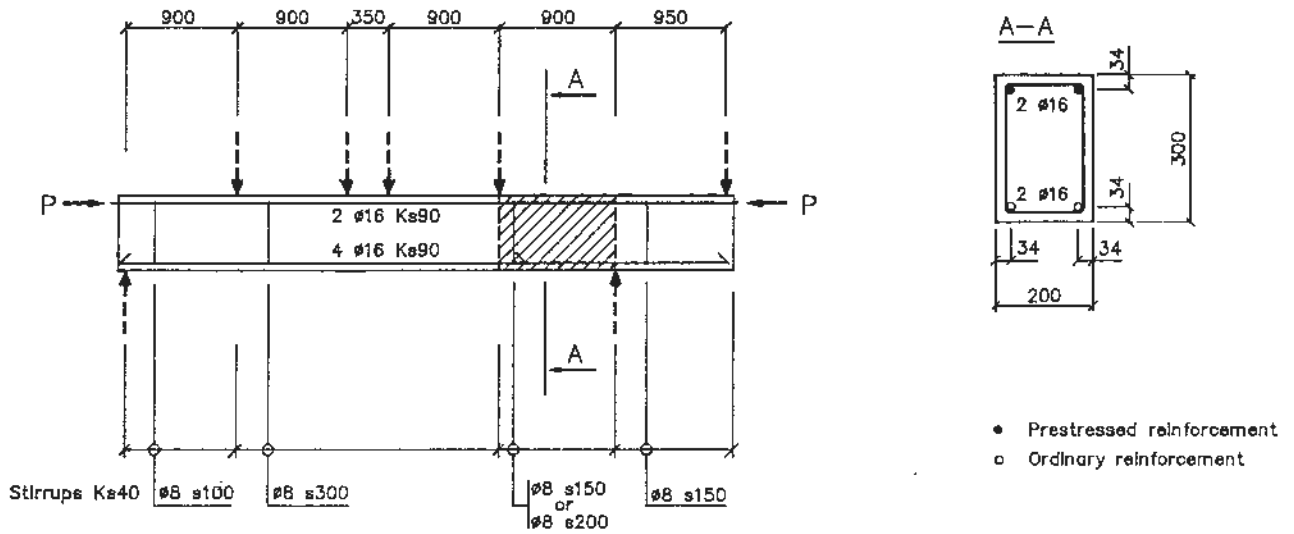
Test beams - Type (A). The figure shows only beams with shear reinforcement in the test area
